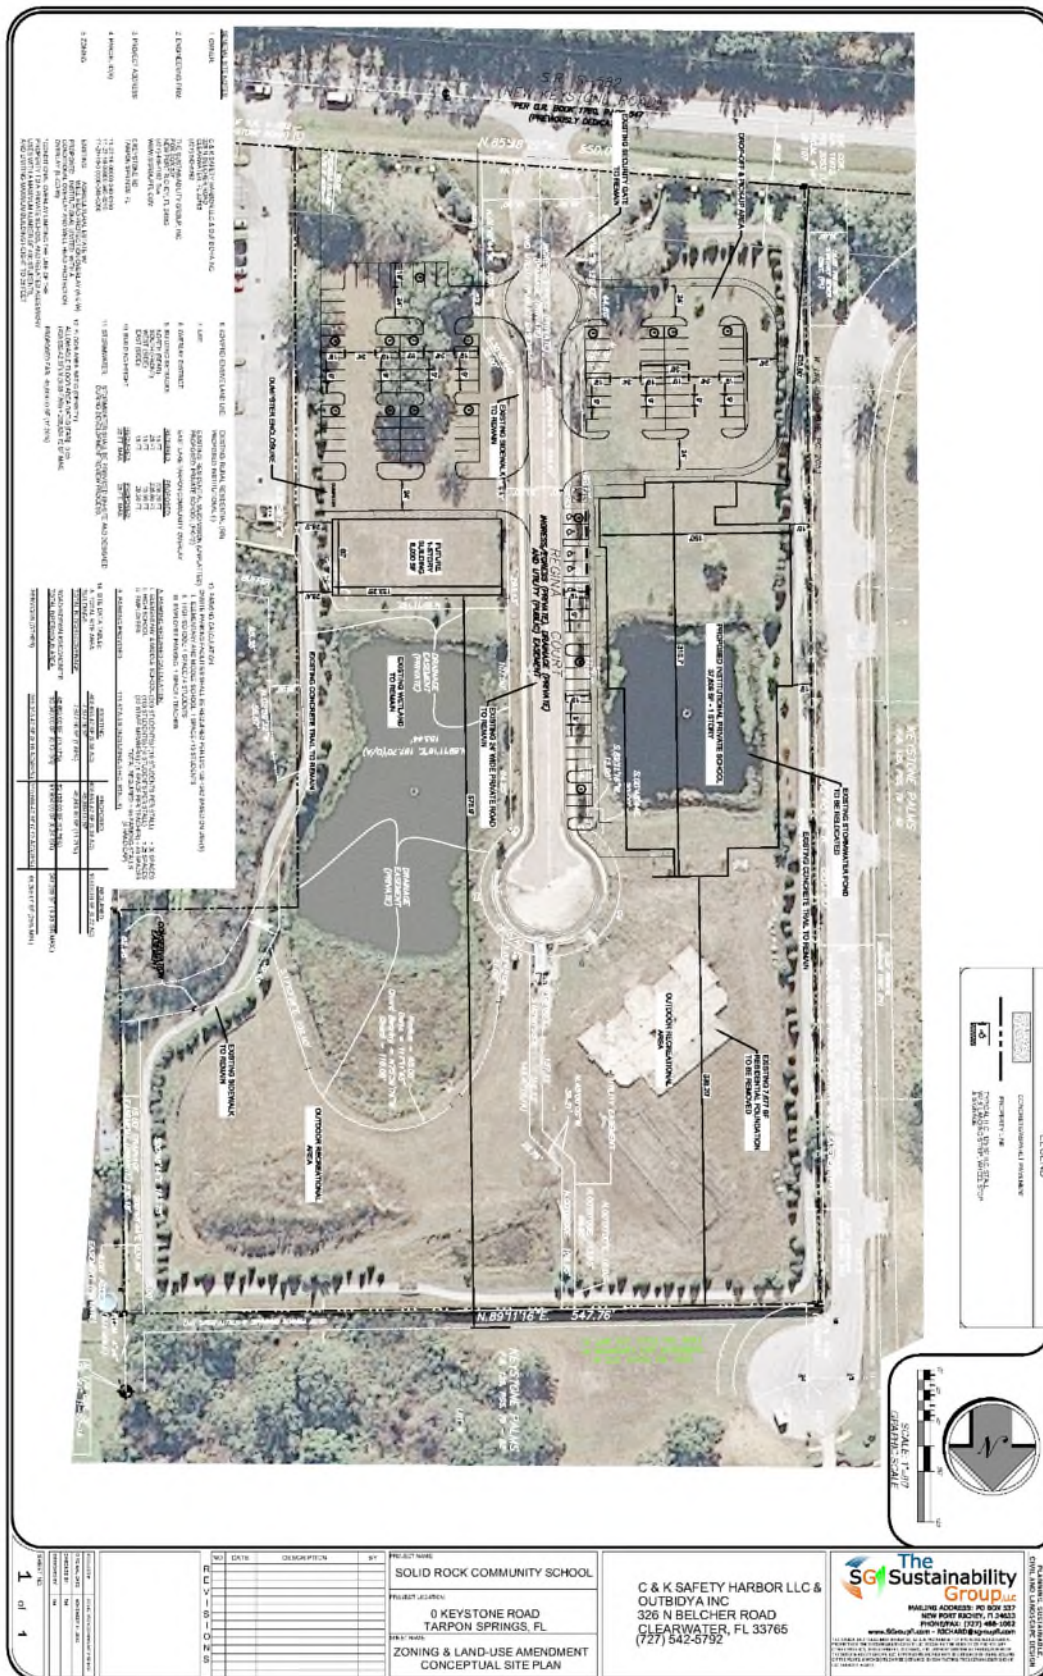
REZONING AND LAND-USE APPLICATION CONCEPTUAL PLAN
